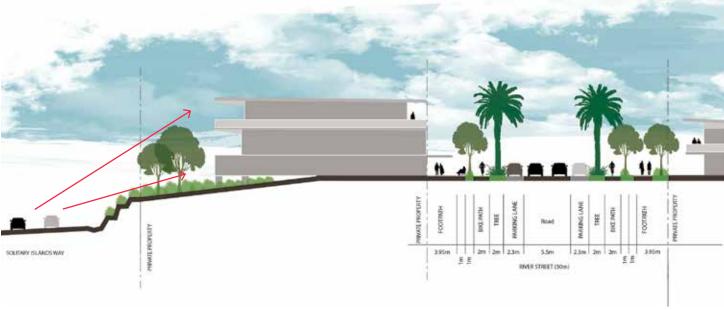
Buffers should be provided to Solitary Islands Way and the rear elevation of buildings should be articulated or designed to so as not to detract from the town centre entry experience from Solitary Islands Way
